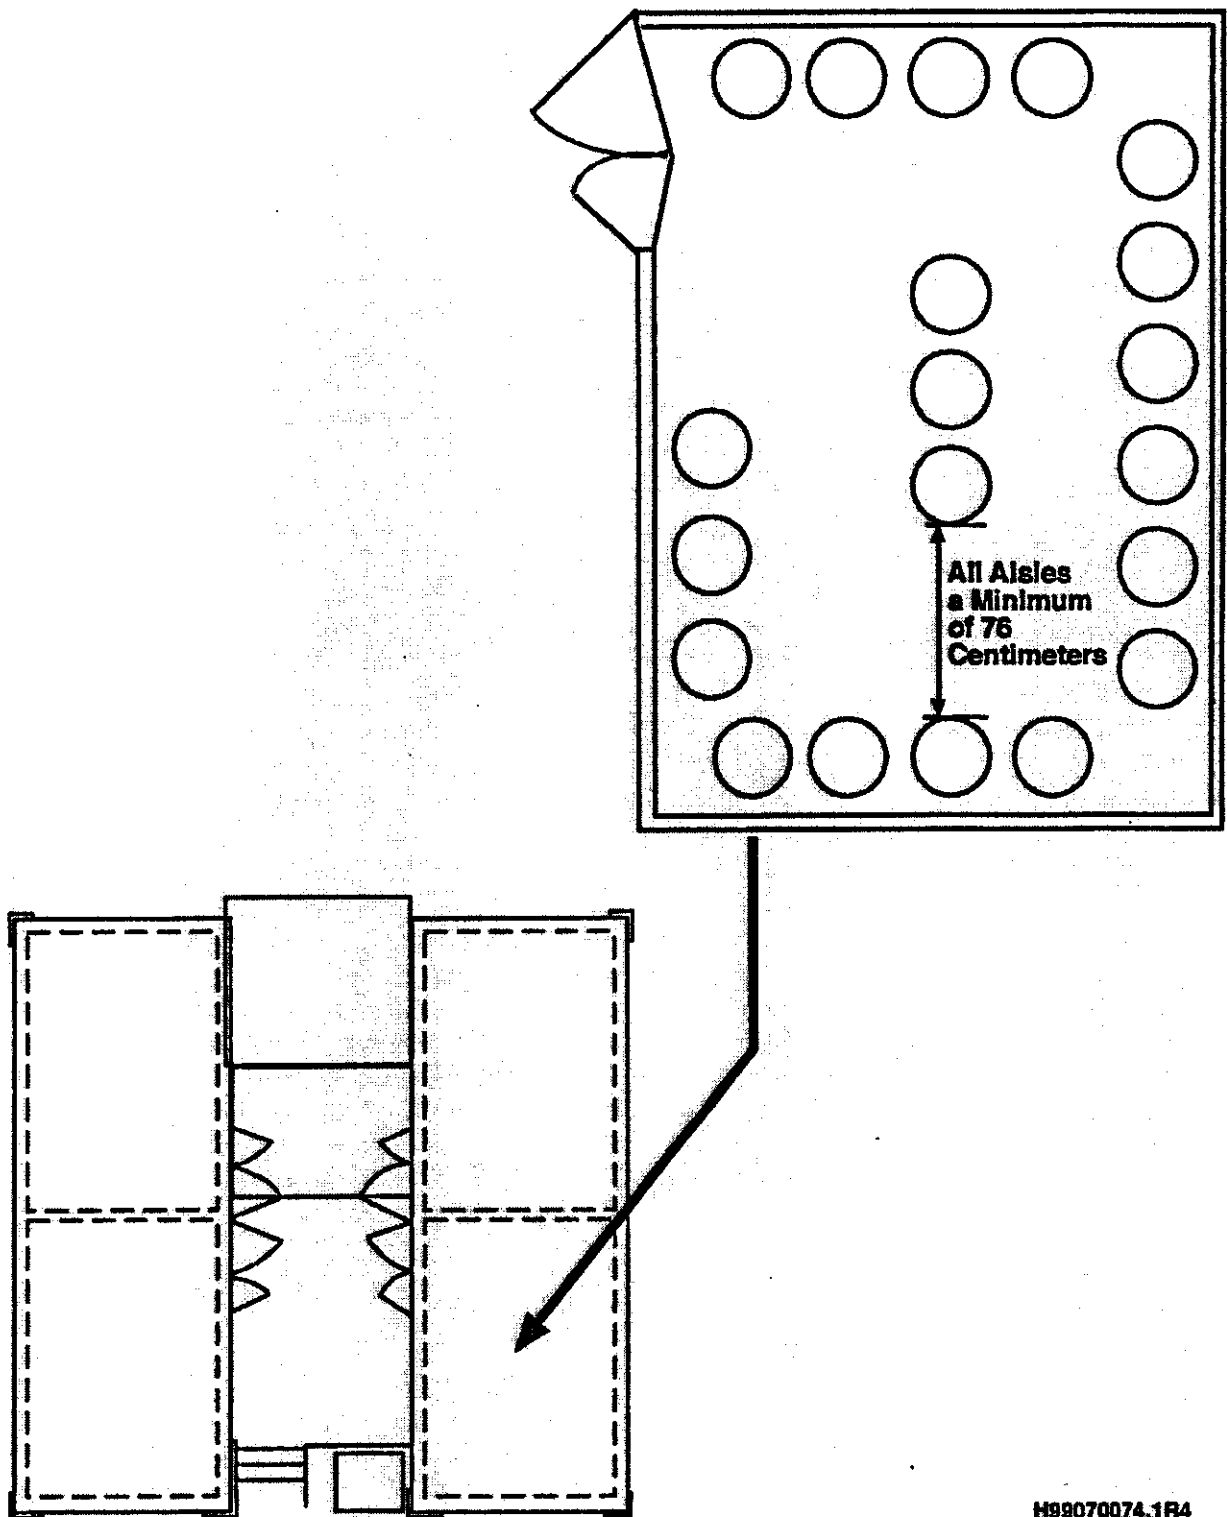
General Layout of Storage in 222-S Dangerous and Mixed Waste Storage Area.
